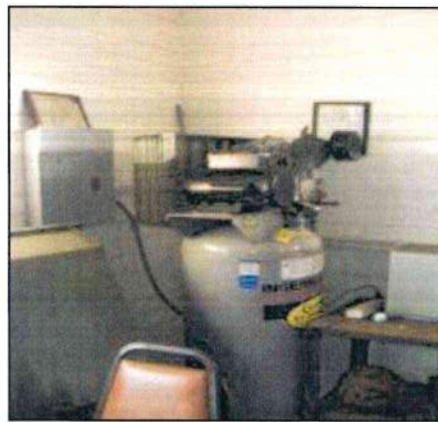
Fire Station #1 The Ingersoll-Rand air compressor is in fair overall condition.
